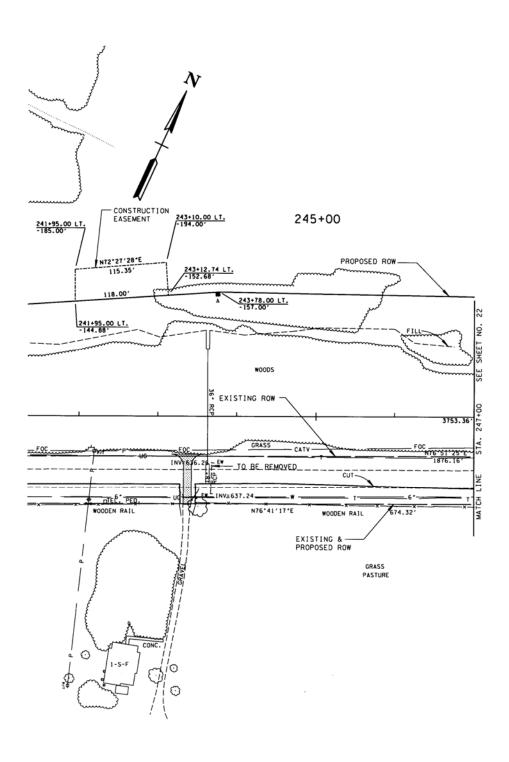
A-3. Portion of Present Layout Sheet (Pipe Culvert)
